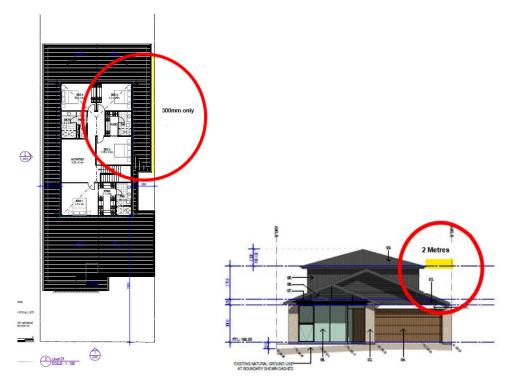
& 7 – Side Boundary Setback of Proposed Development
